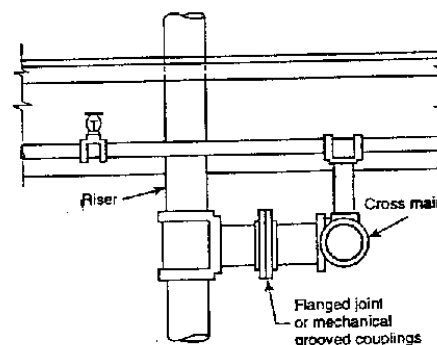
One arrangement of flanged joint at sprinkler riser.
